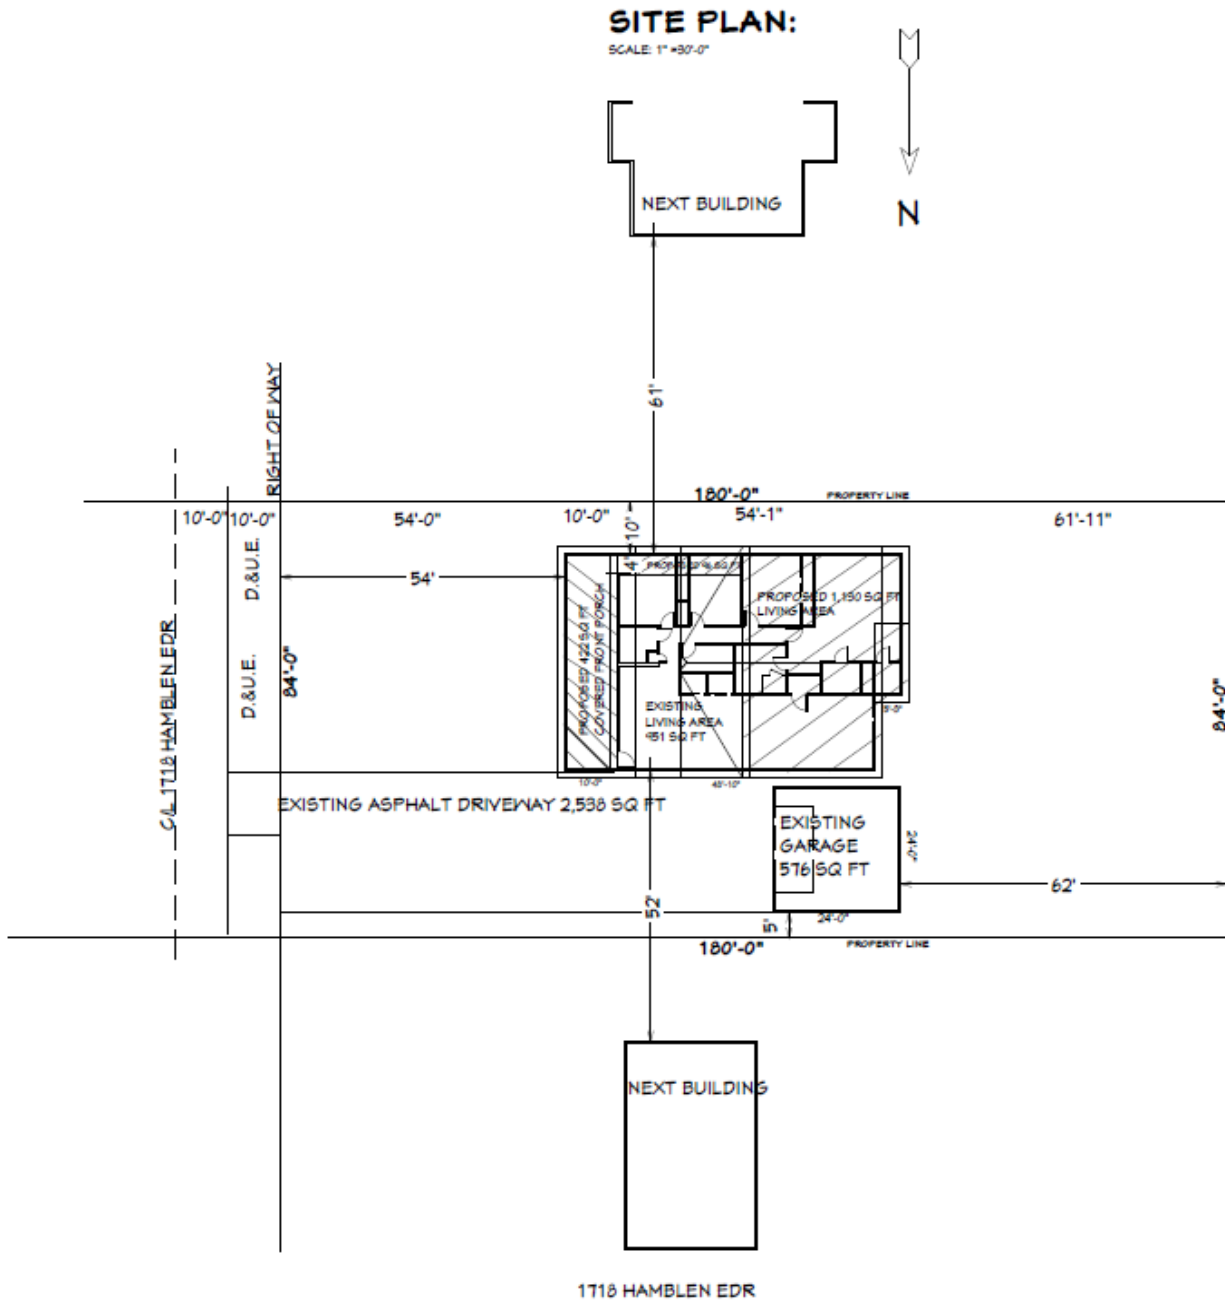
Proposed site plan for 1718 E Hamblen E Drive.
